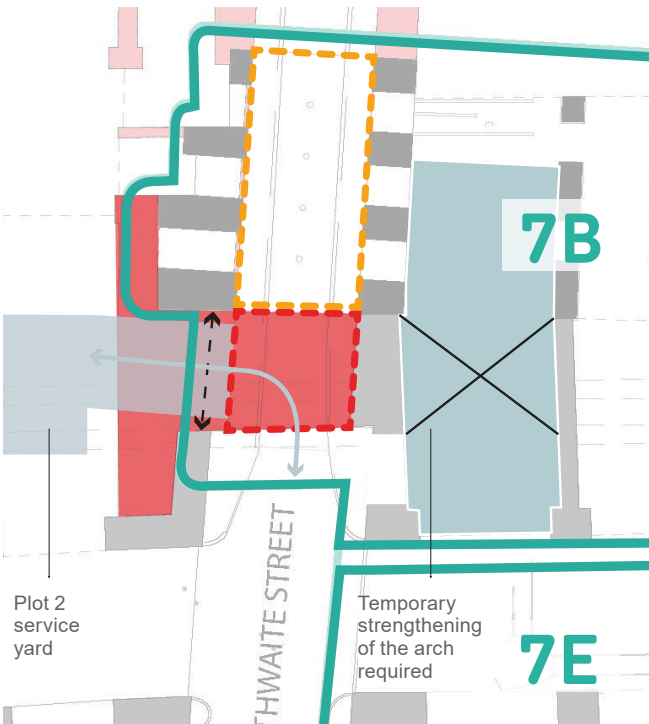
Plan showing proposed demolition along Braithwaite Street
